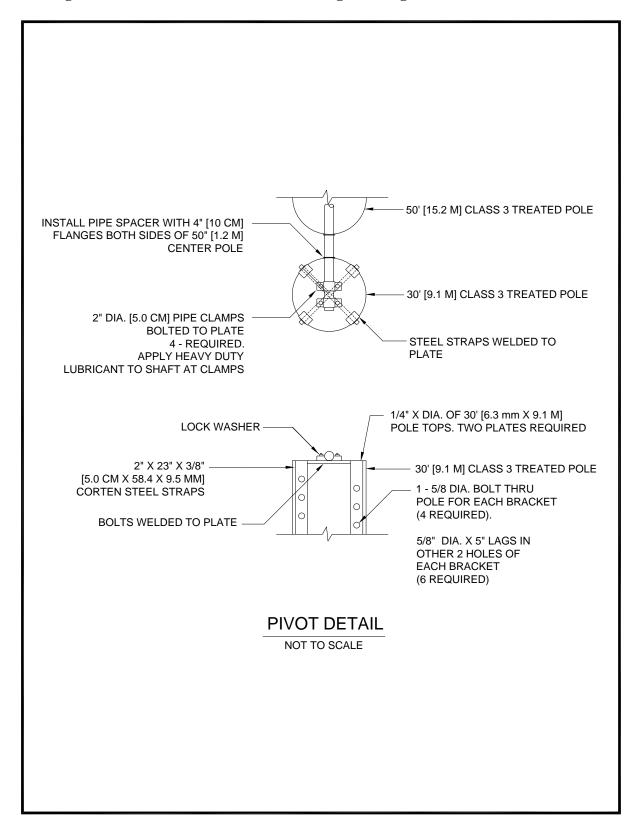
Standard Details for Pivoting Rotating Beacon Pole – Rotating Beacon and Mounting Bracket Detail
